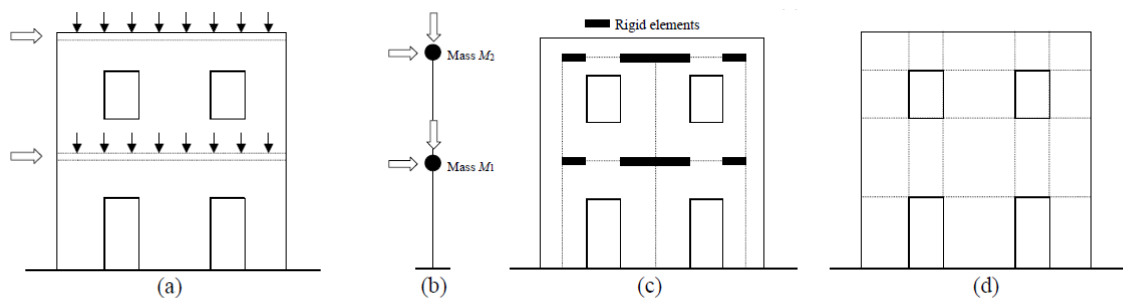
Structural components modelling techniques for masonry wall system (a): lumped masses (b); equivalent frame (c); panel system (d) [2].
